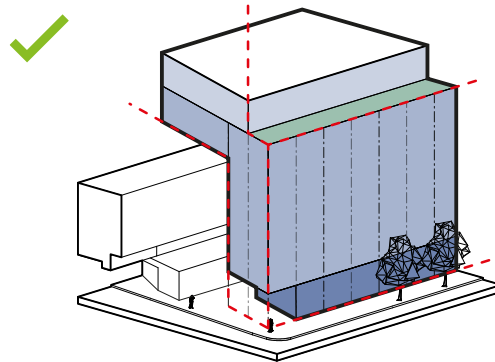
Acceptable: Northeast corner achieving public space through the maximum parameter (cantilevered recess)
